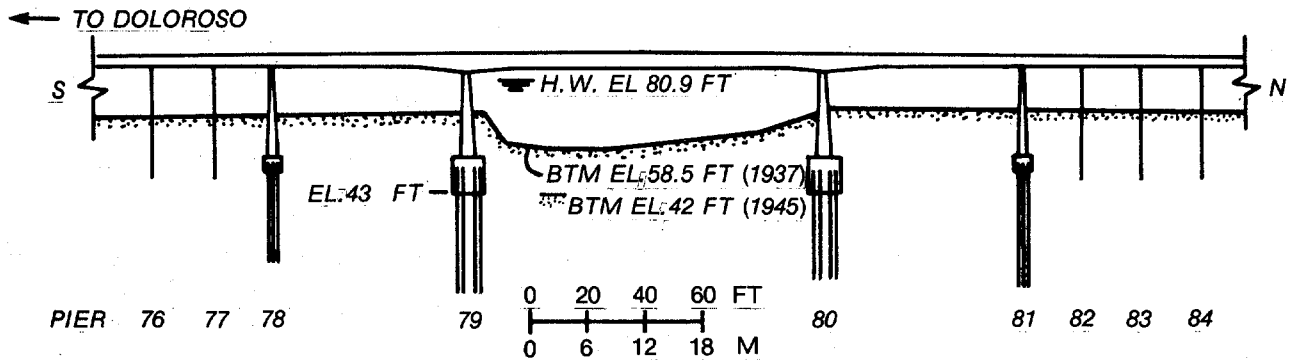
Elevation sketch of main-channel spans of US-61 bridge, which failed in 1955, from plans dated 1937.
